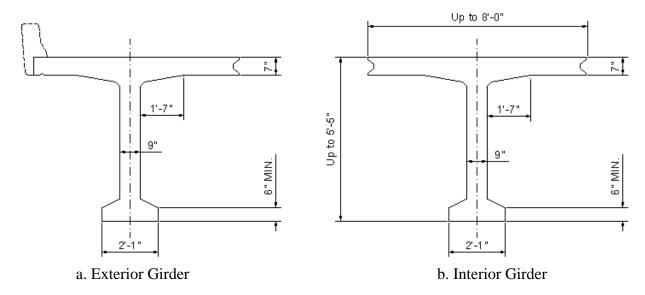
Revised Decked Bulb-Tee Girders Based on Type W65DG Decked Girder³
